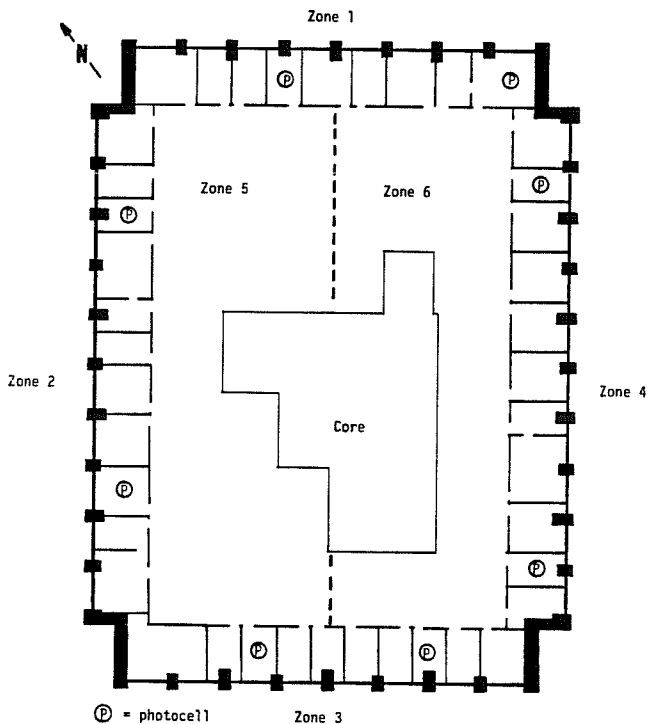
Floor plan of 30th floor Pacific, Gas & Electric Co. building showing daylighting zones and placement of control phototensors.
